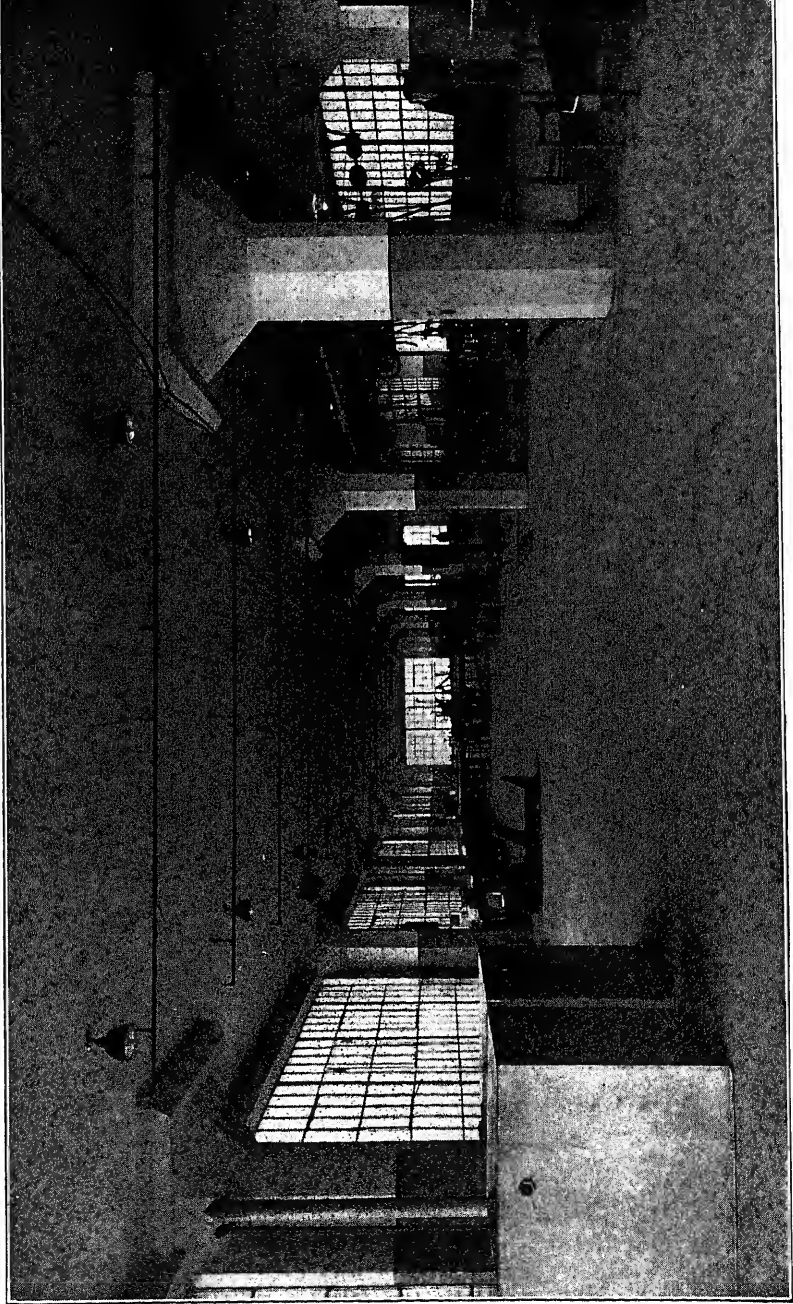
Interior of H. T. Heinz Company Warehouse, Showing Example of Flat-Slab Ceiling Construction
